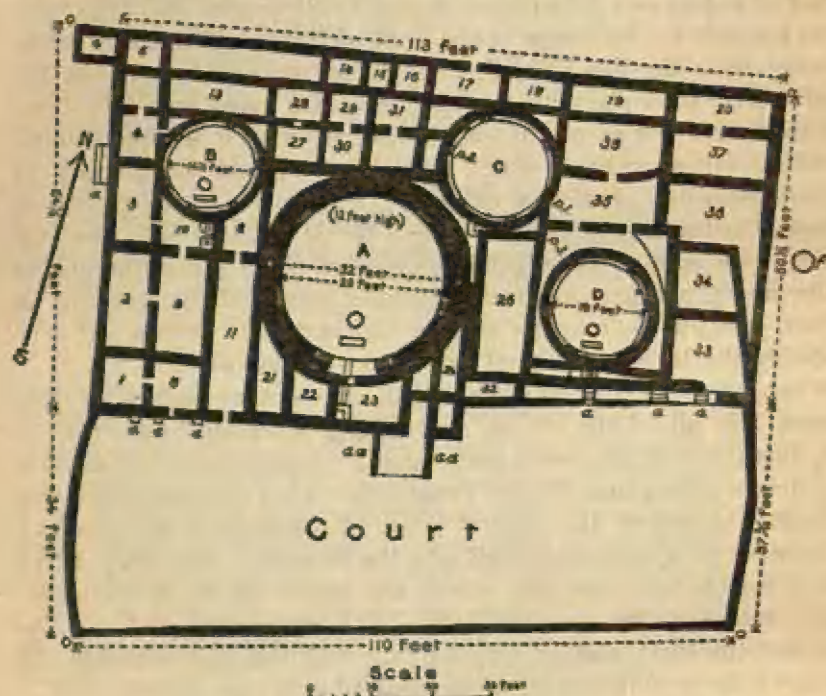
Ground plan of Far View House. Mesa Verde National Park, Colorado.
